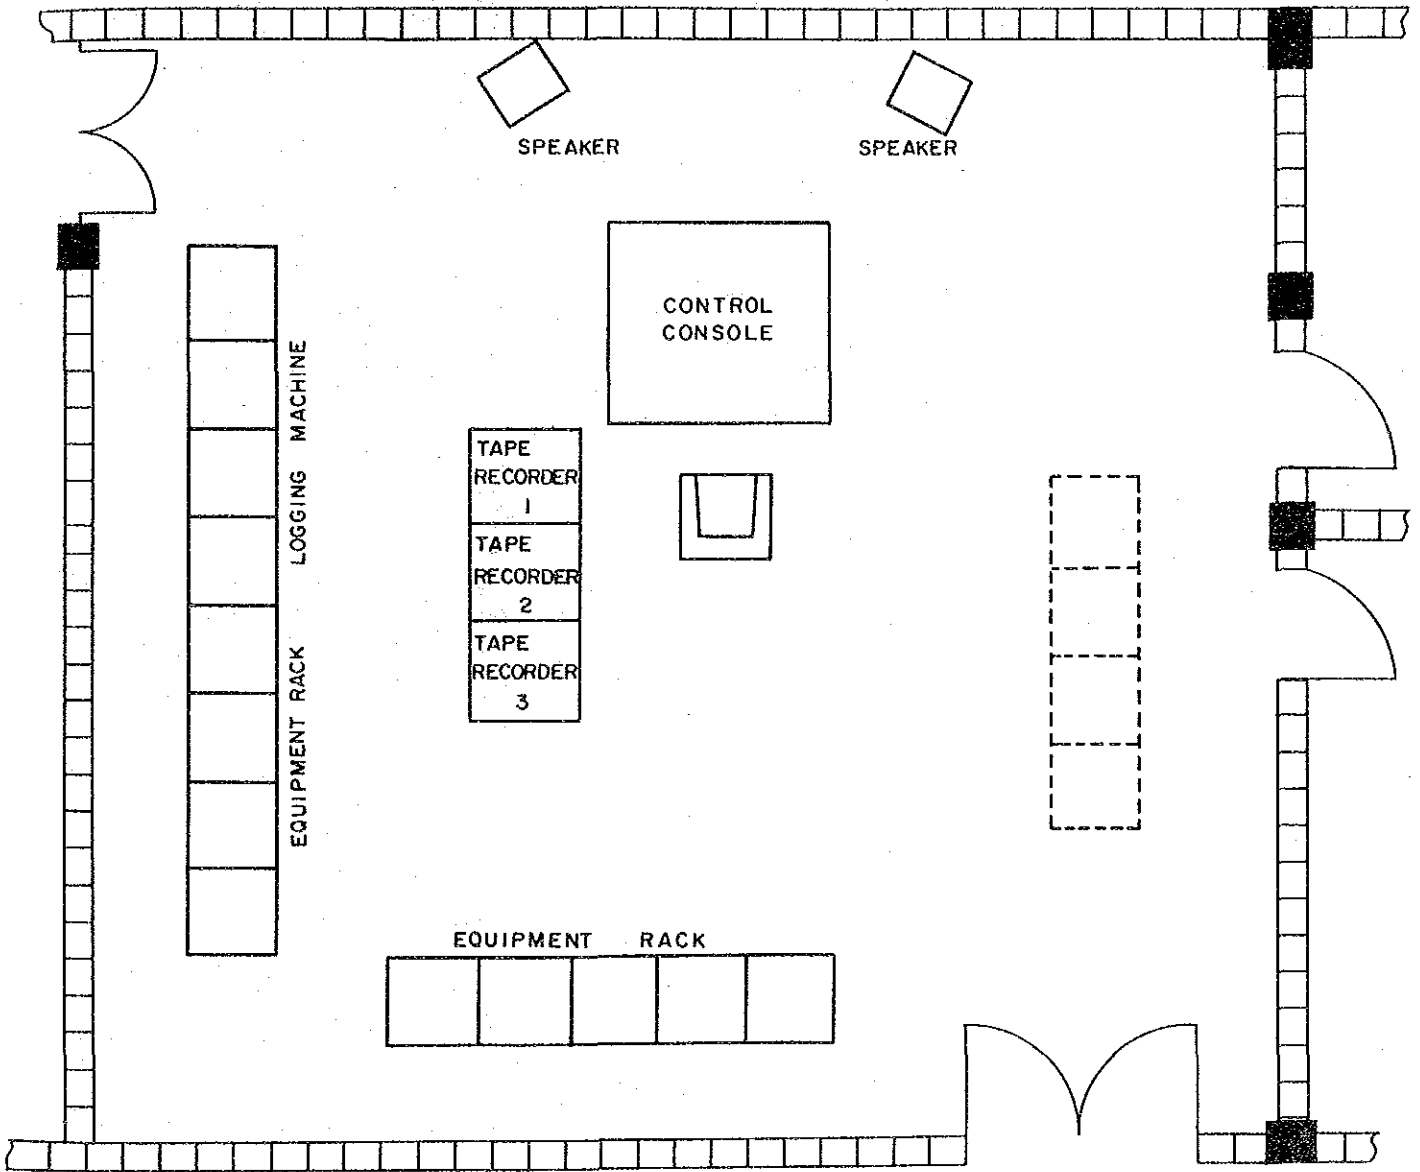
FLOOR LAYOUT OF MASTER CONTROL ROOM
